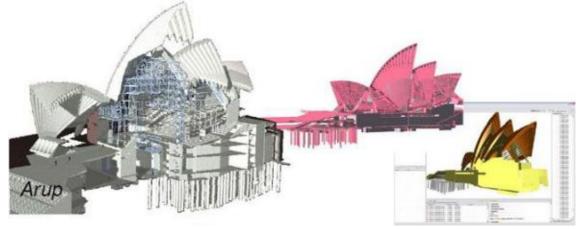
Example for the structural and architectural model for the SOH (Sabol, 2008).
